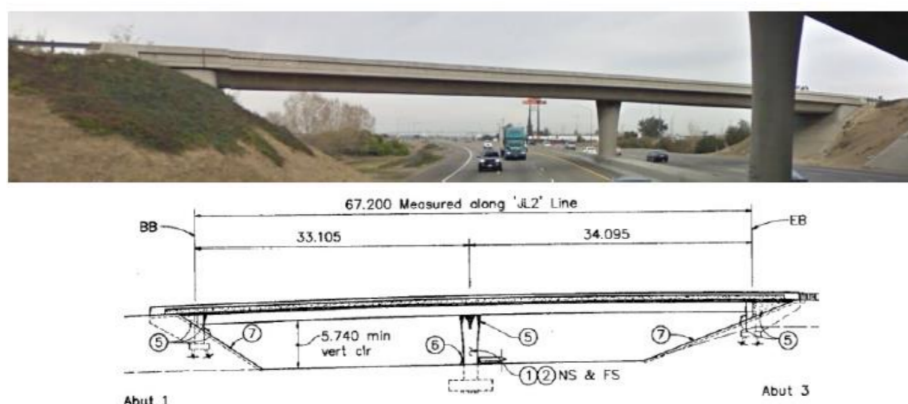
Photograph and design elevation of Jack Tone Road Overcrossing Bridge (Bridge-A).
